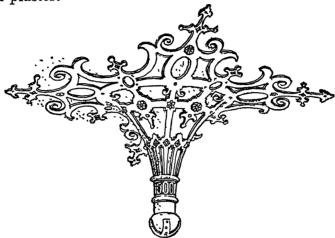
Pendant, Ceiling in Crewe Hall.
